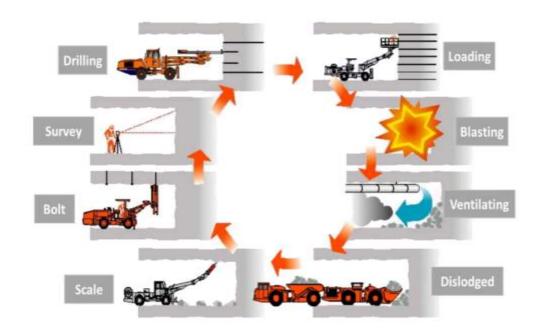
Drill and Blast Construction Method (Sandvik, 1999)
